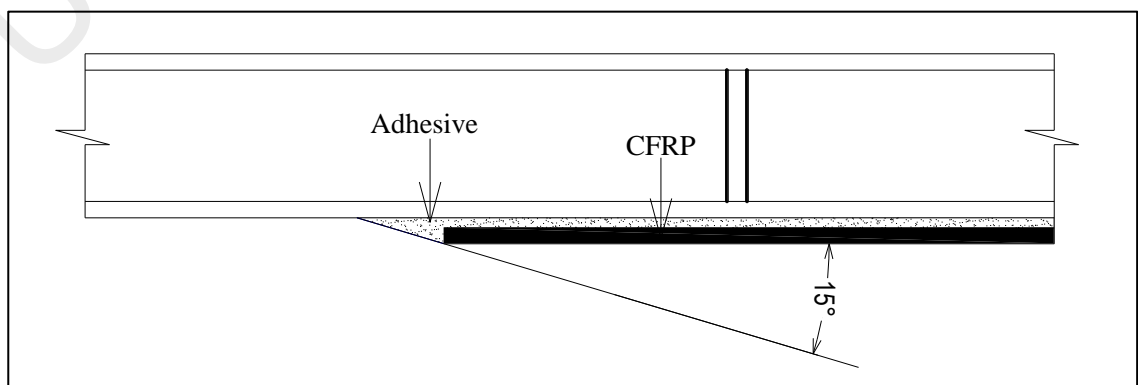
In-plane CFRP end cutting shapes with triangular adhesive fillets
